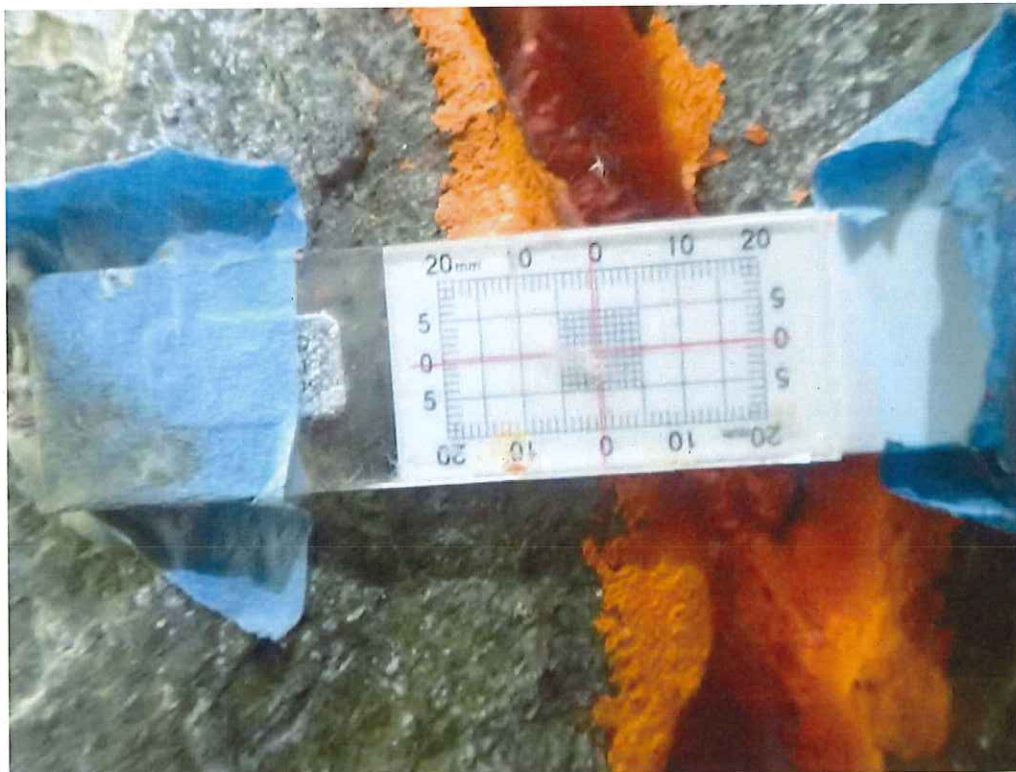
Slab 6 underside near Mid-span: Transverse hairline crack with efflorescence. Note: Crack Gauge.
